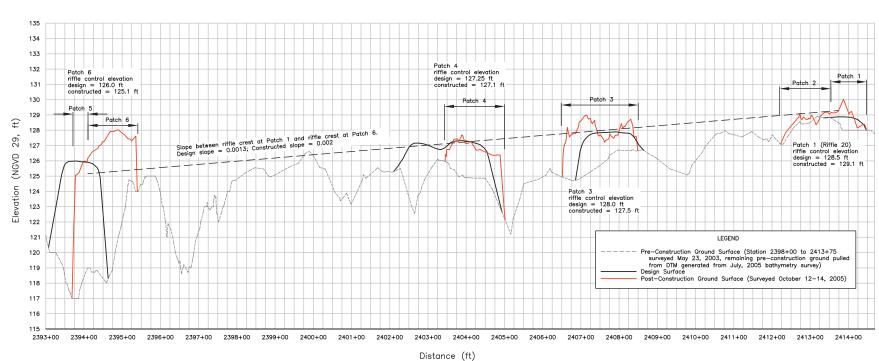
Longitudinal profile of existing, design, and as-built ground surfaces using pre-construction alignment. Longitudinal stationing and channel alignment location is shown on Figure 15.
